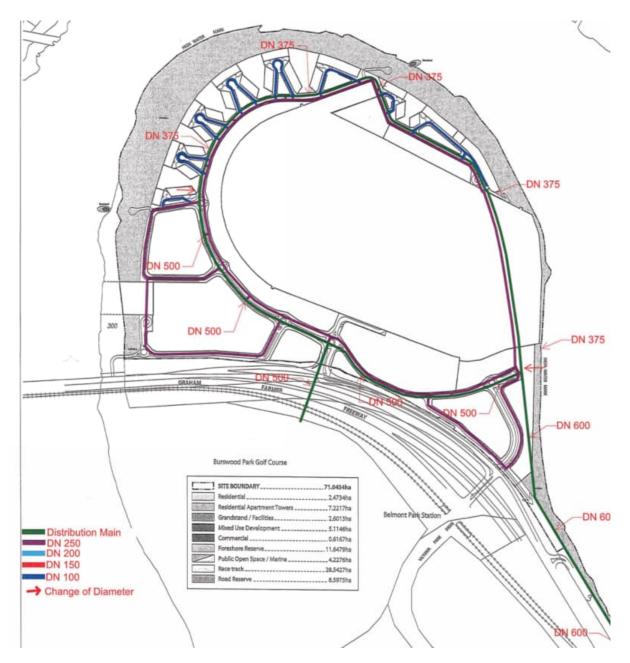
Proposed Water Supply Strategy to be adapted for new Precinct A Plan layout
